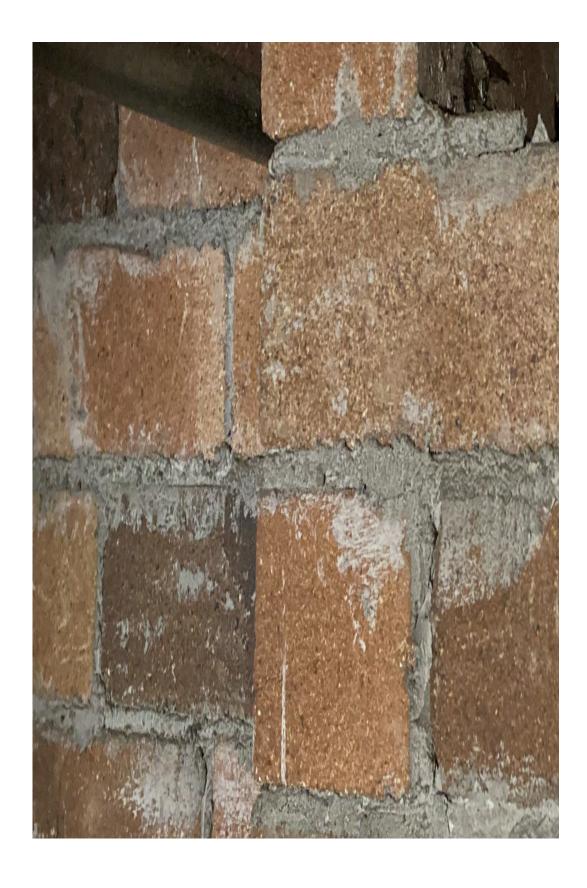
Photo of party wall in disrepair from 24 Thornton Street roof attic
